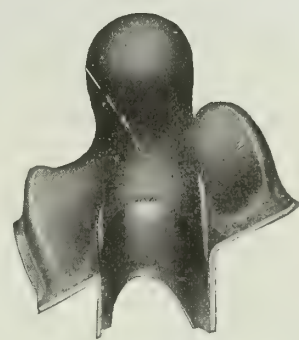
Tile-Starter or Eave Tile, with Closed End for Edge of Roof at Gutter
